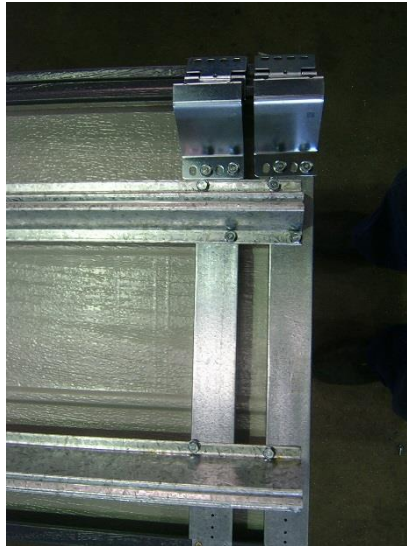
C3 & C4 Strut Fixing (Bottom strut adjacent top of centre hinge)
